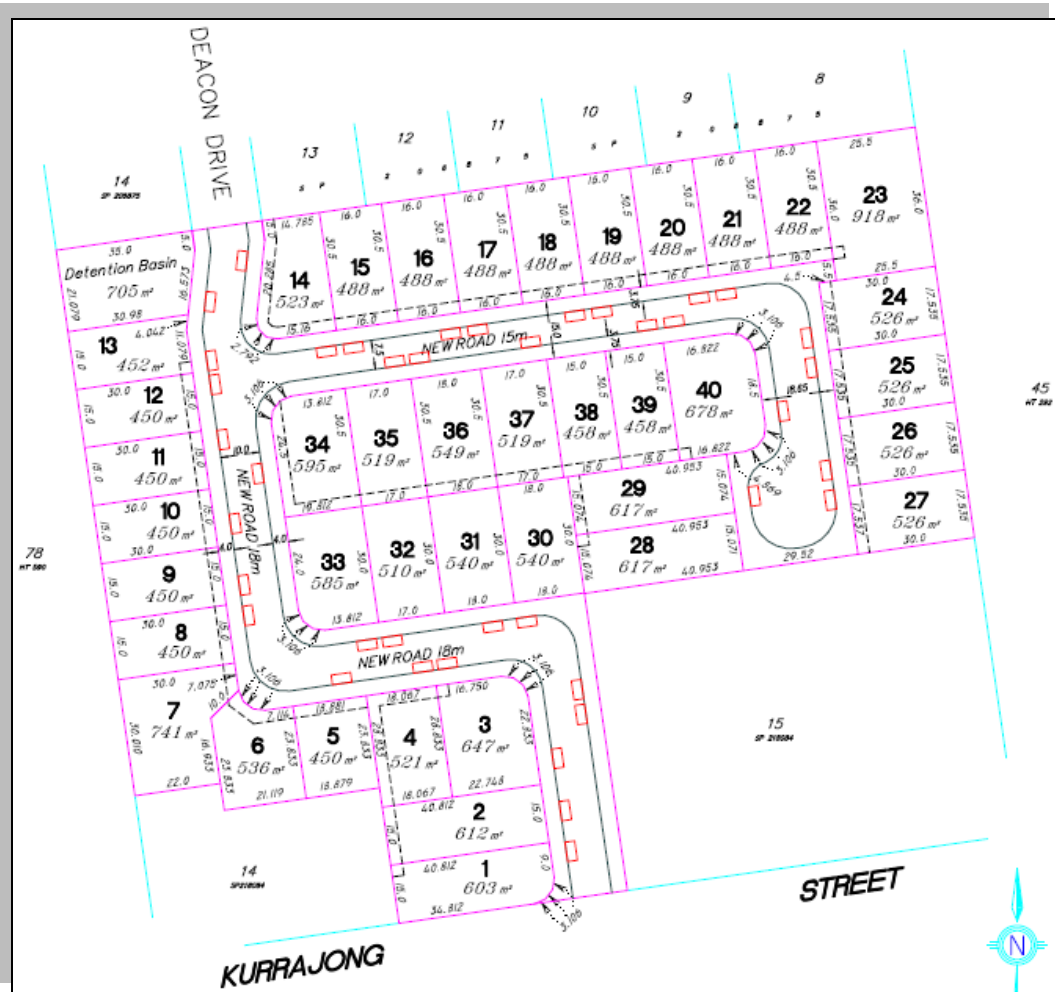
Proposed Subdivision Plan prepared by Lawson Surveys
